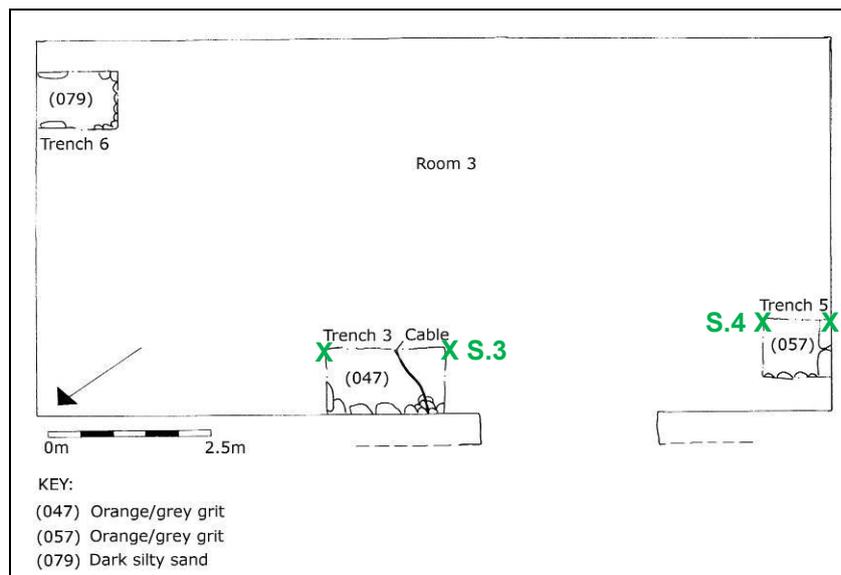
Plan 4 showing Trenches 3, 5 and 6 Room 3. Location of sections 3 and 4 indicated in green
